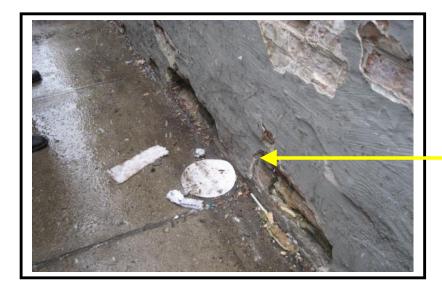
Spalling brick faceeast exterior wall.
